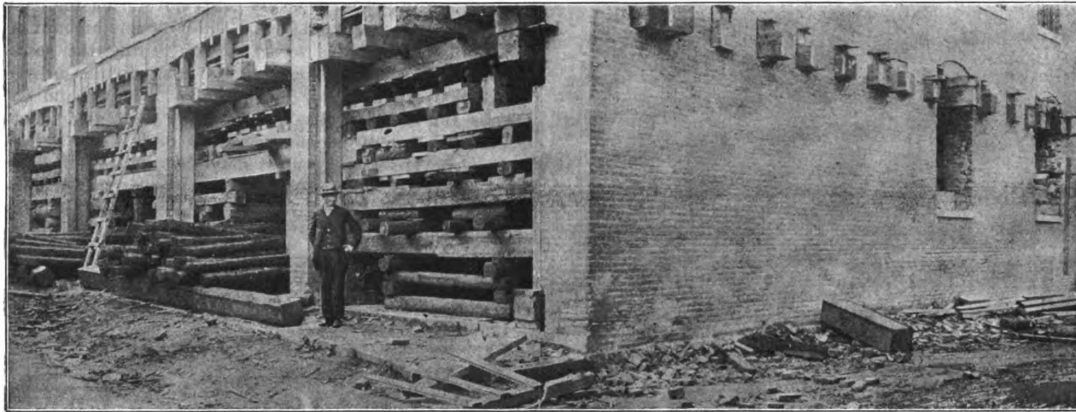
View Showing the Building Supported on 500 Jack Screws Ready for Raising.
